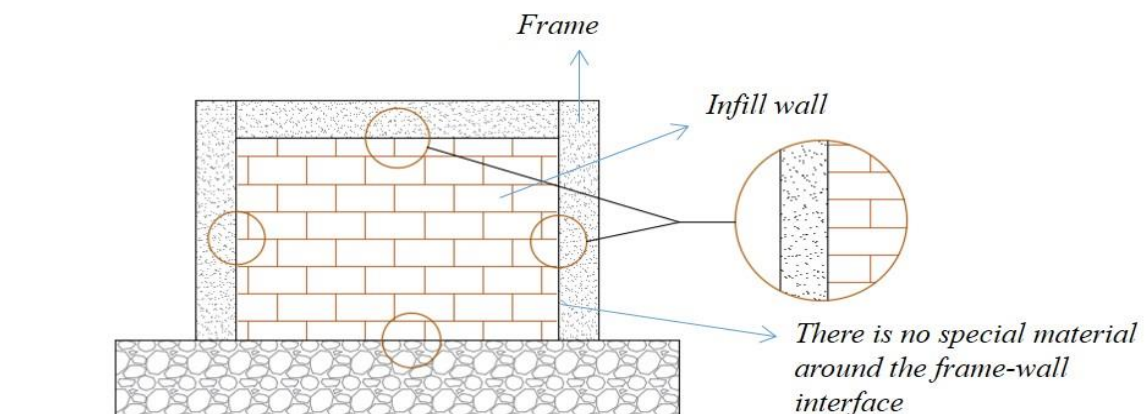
Details of first specimen components of RC frame with infilled masonry wall
